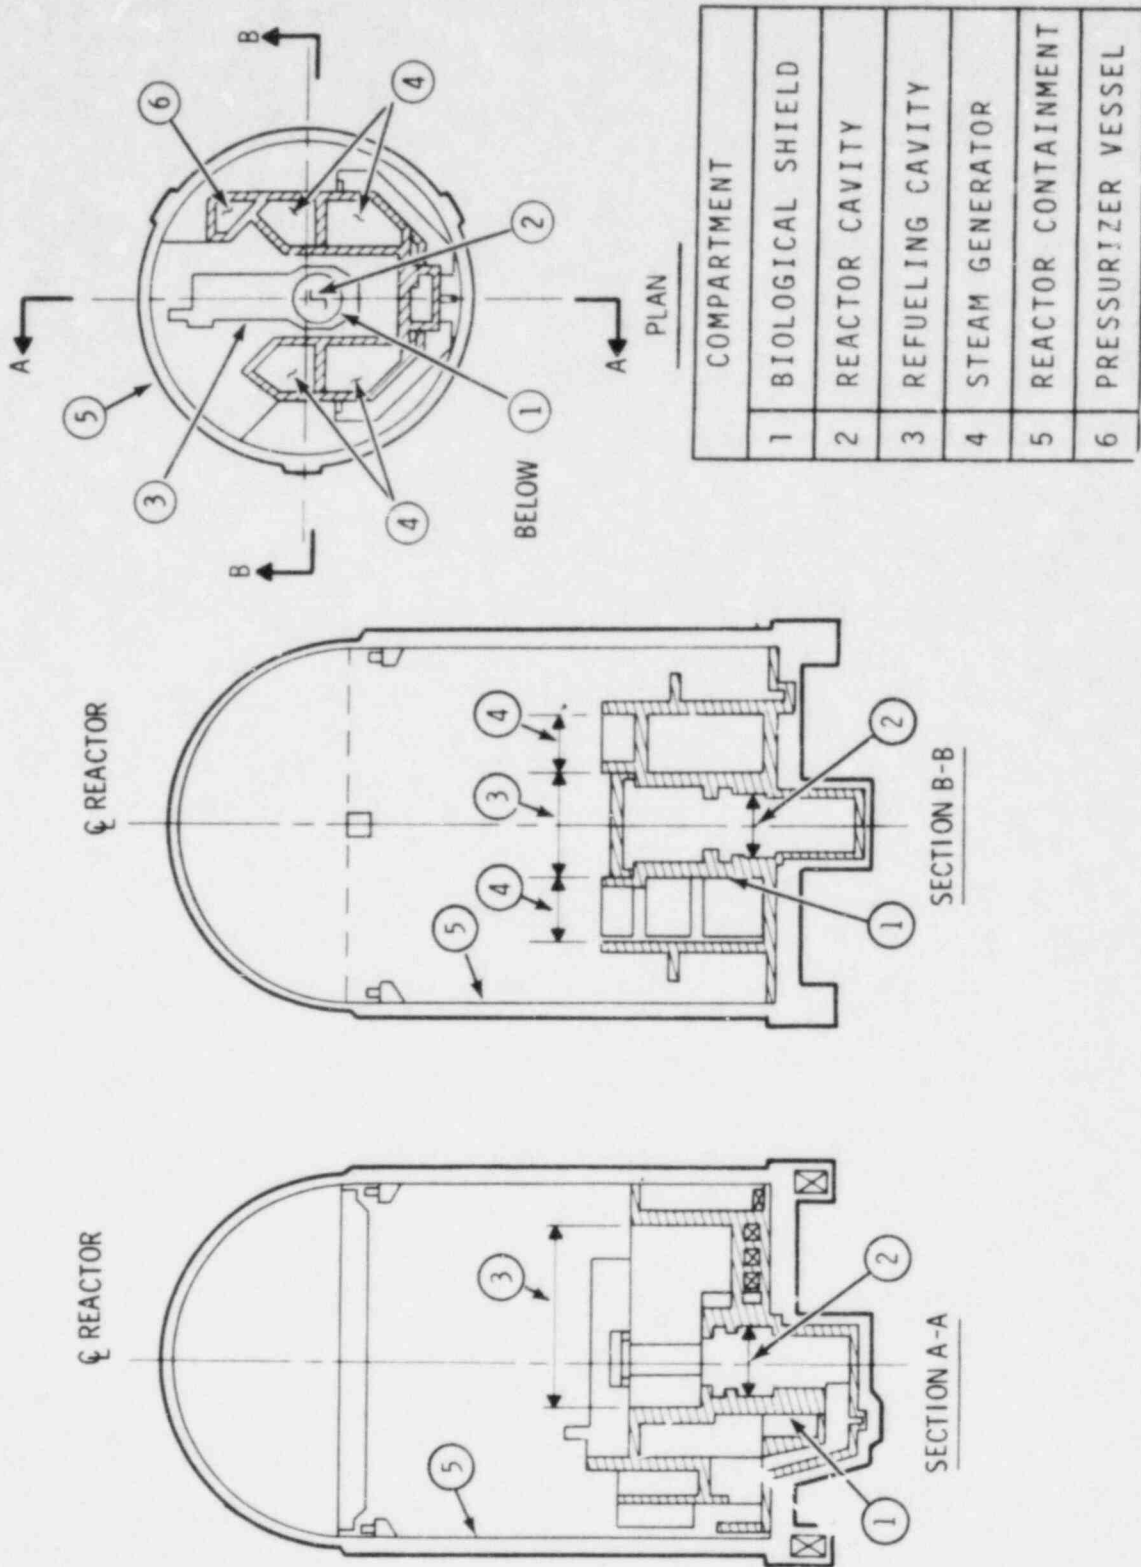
Major Structural Components of PWR Containment Building
